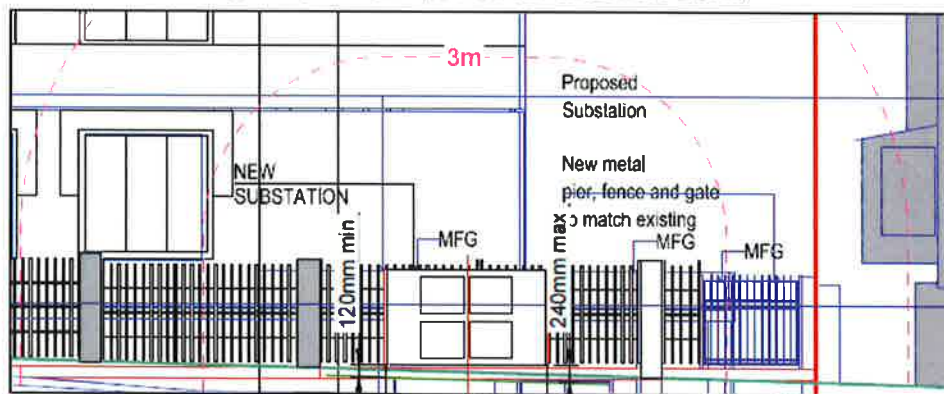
| Site plan of proposed substation (Source: SSD 6952 MOD 2 2018)
